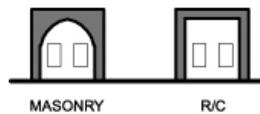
The difference between closed spaces of masonry and reinforced concrete construction.
